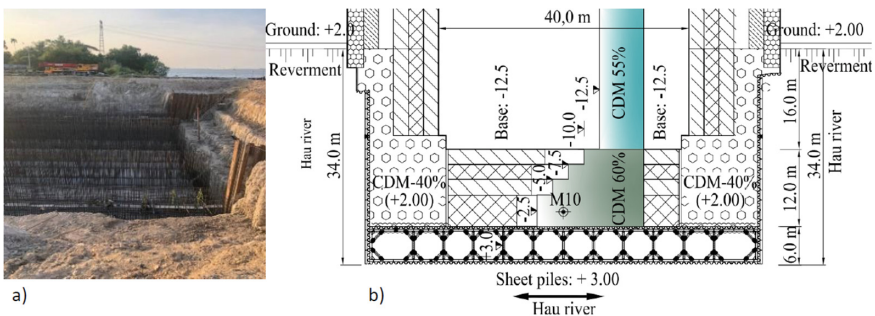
The cofferdam of the water intake of the Song Hau thermal power plant [3]: a Photograph of site; b Cofferdam plane
